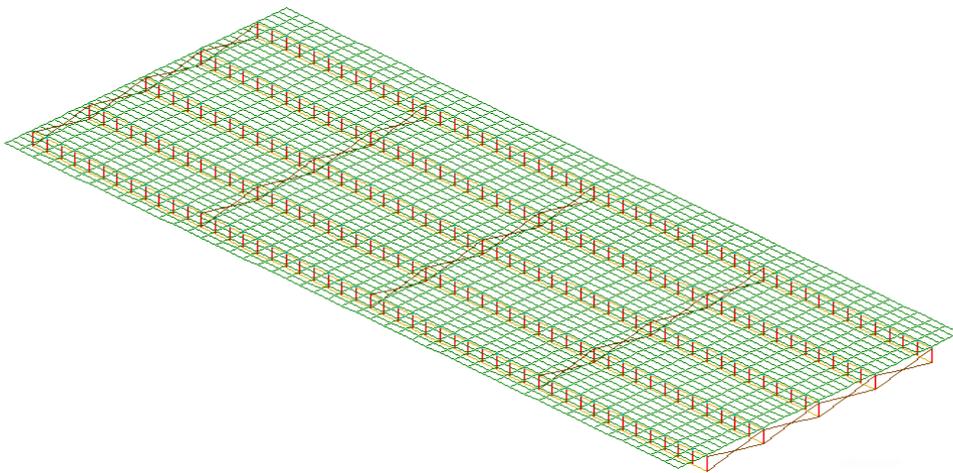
Finite element model of a 29.3 m long bridge with 5 girders at 2.44 m spacing
